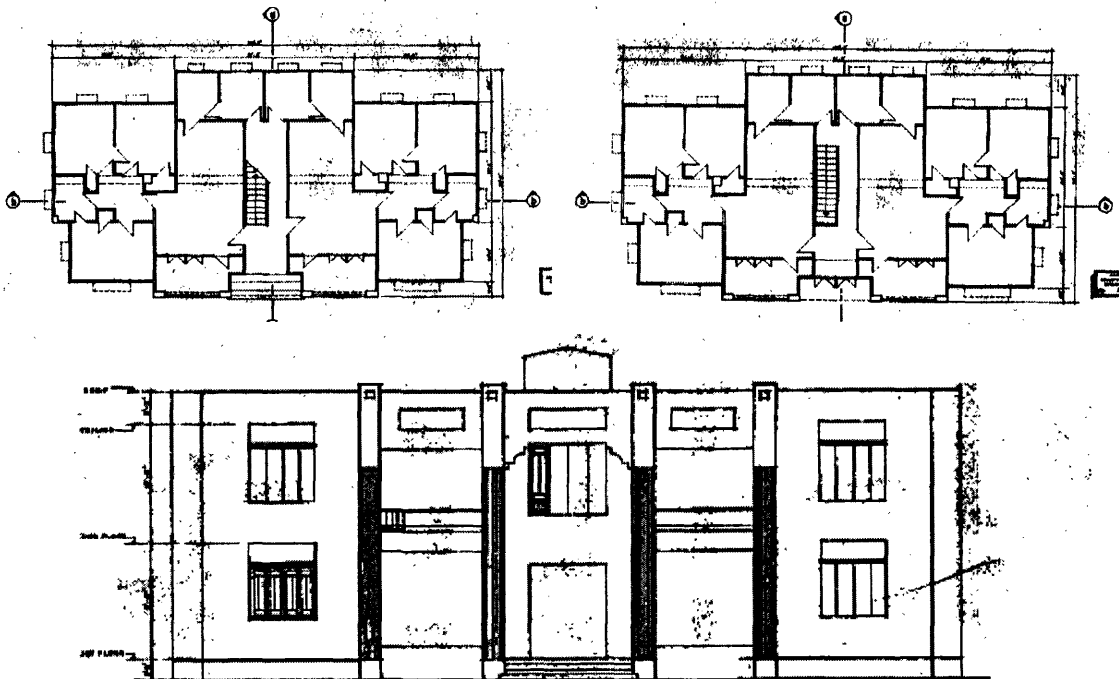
Floor plans and elevation of the Figuroa Apartments. Drawings by Luis Gutiérrez, AIA, 1988.
